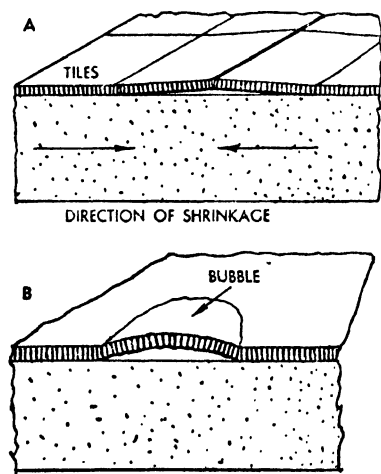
A. Arching caused by contraction of concrete sub-floor. B. Bubbling in asphalt flooring due to the unsatisfactory surface of the sub-floor.
